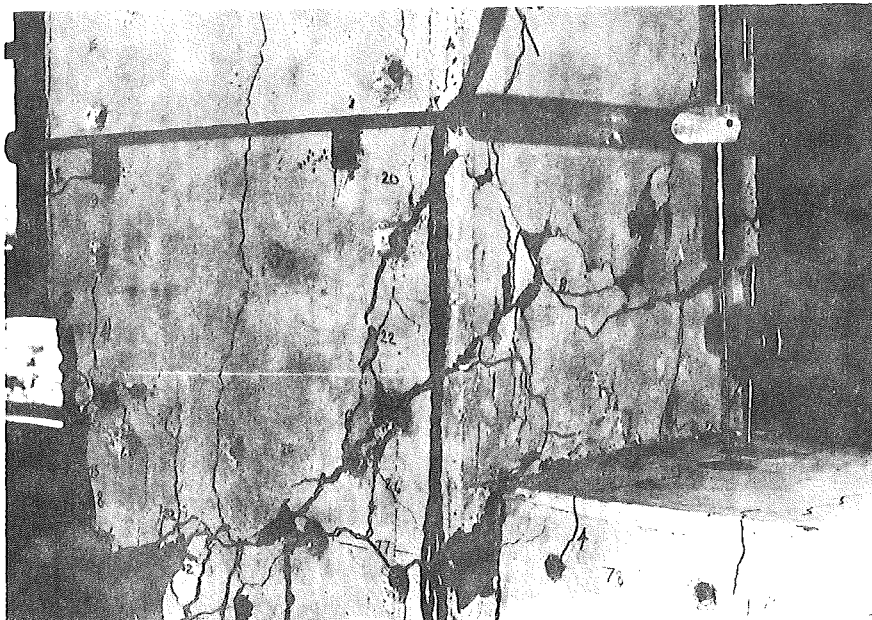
CRUSHING OF CONCRETE IN COLUMN
